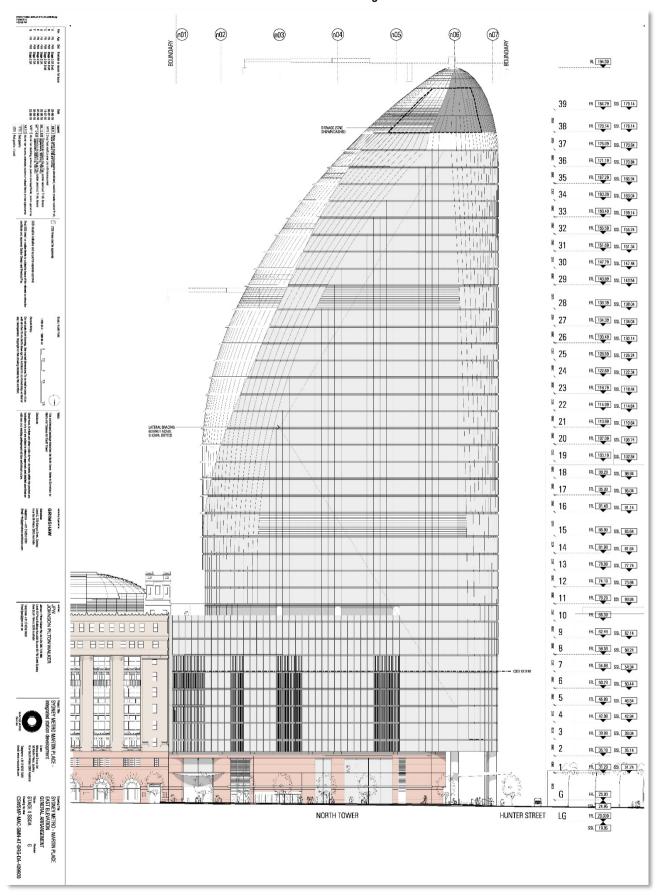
North Site Tower — East Elevation (Top Floors & Height RLs)
